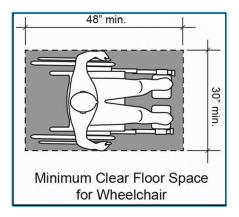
Floor Space clearnace for wheelchair (IS4963.1987)
